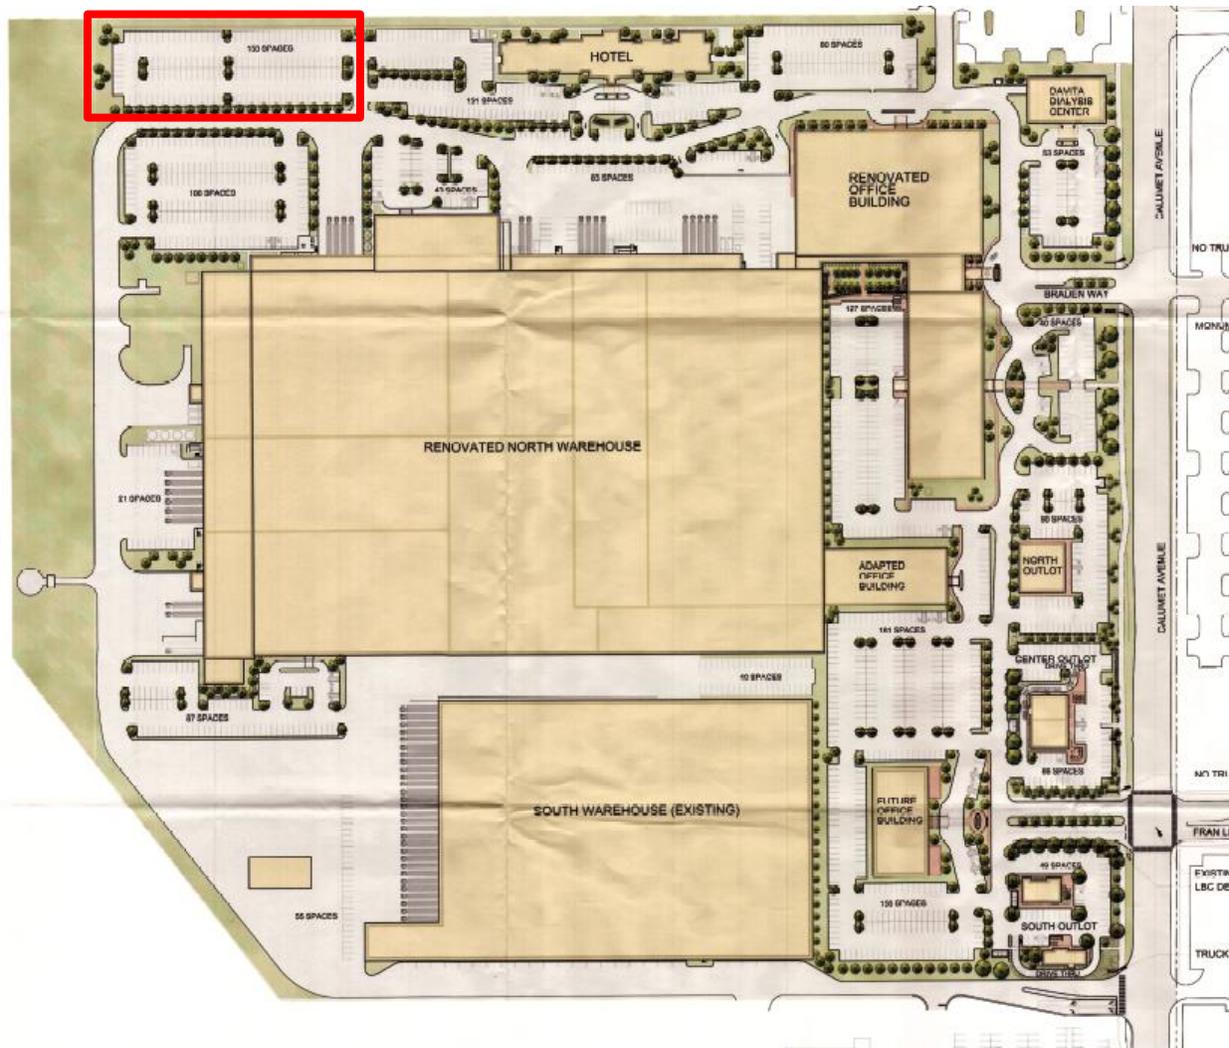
Lake Business Center site plan. Subject property outlined in red.
